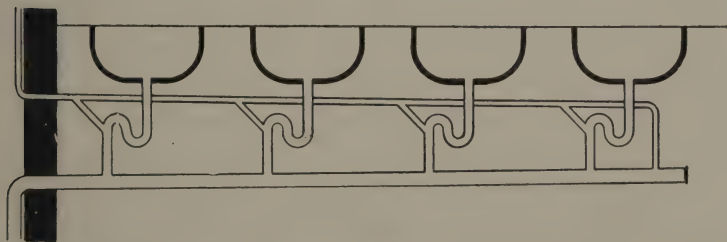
Basin Range with Dead End on Outlet Pipe.
